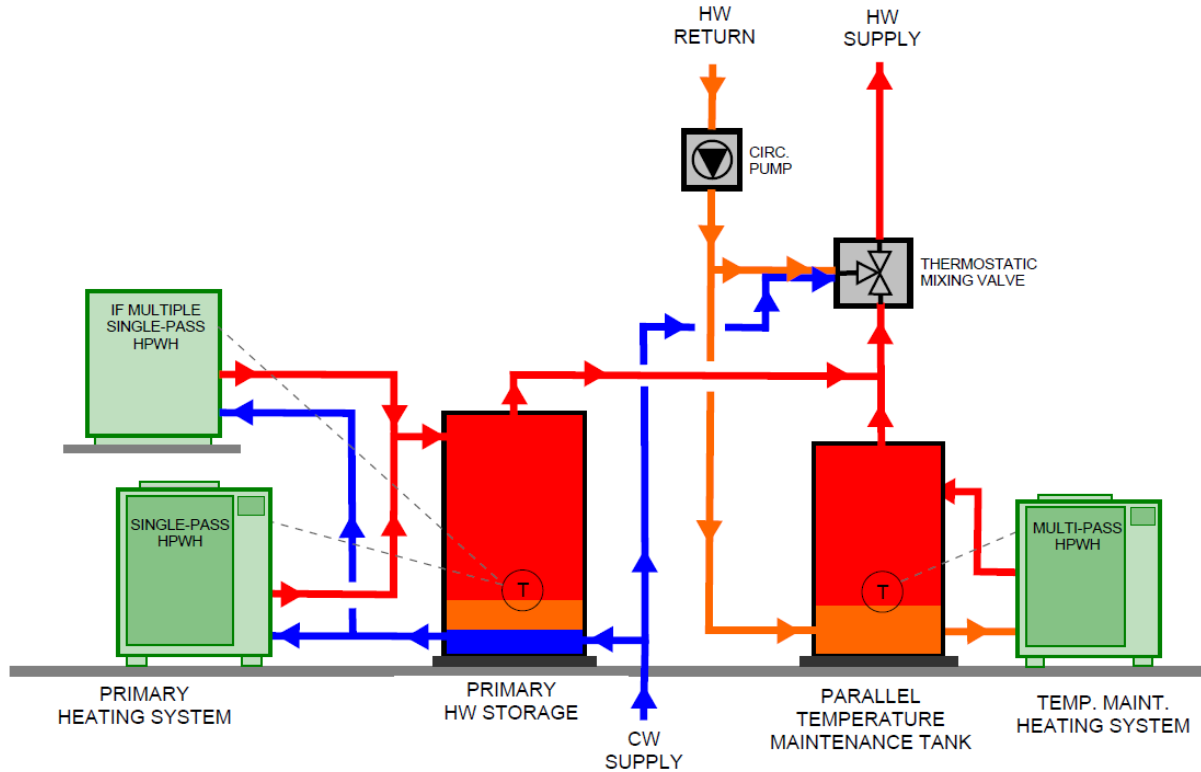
Example single-pass heat pump primary with multi-pass heat pump secondary.
